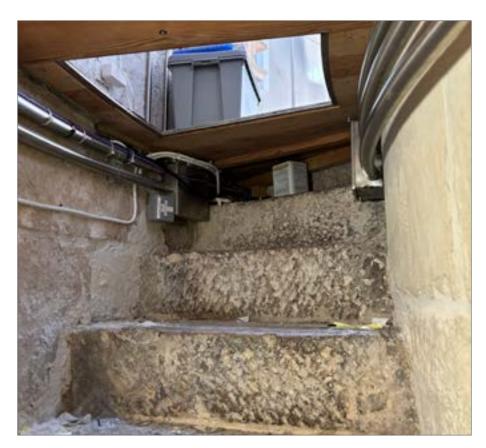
Looking up from the basement steps to the floor access hatch opening, 2024
